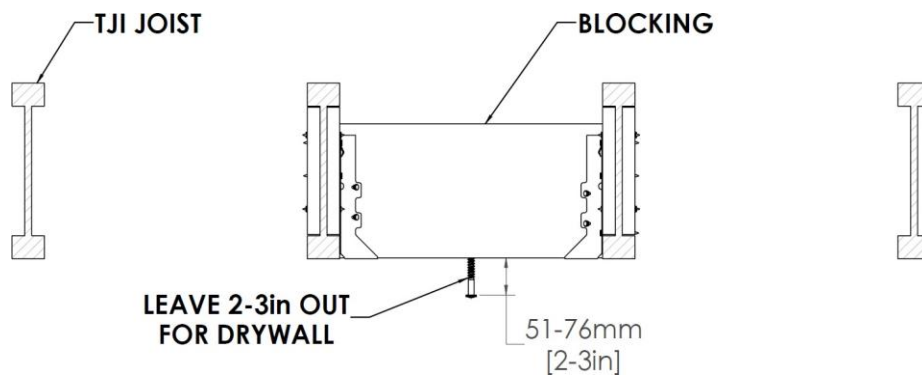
Structural Wood Screw or Lag Bolt Extending 2"–3" Below the Joist, so Ceiling Drywall Can be Installed Around It
